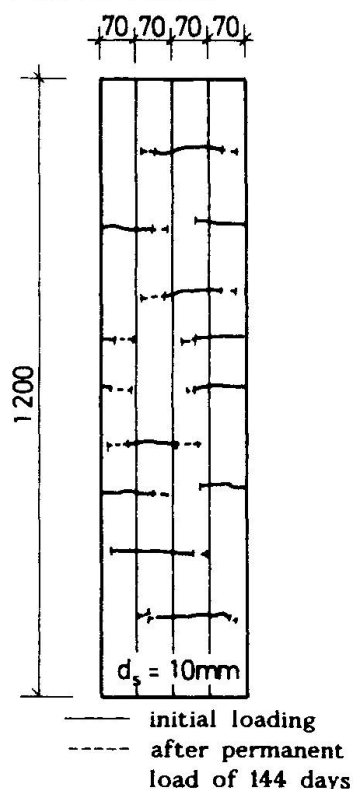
Crack pattern of intended centrally reinforced specimen DAUER 4
